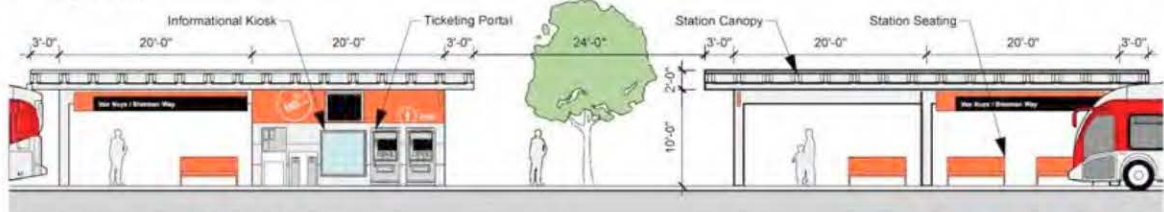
Illustrative Design Details for Curb-Running BRT Alternative
